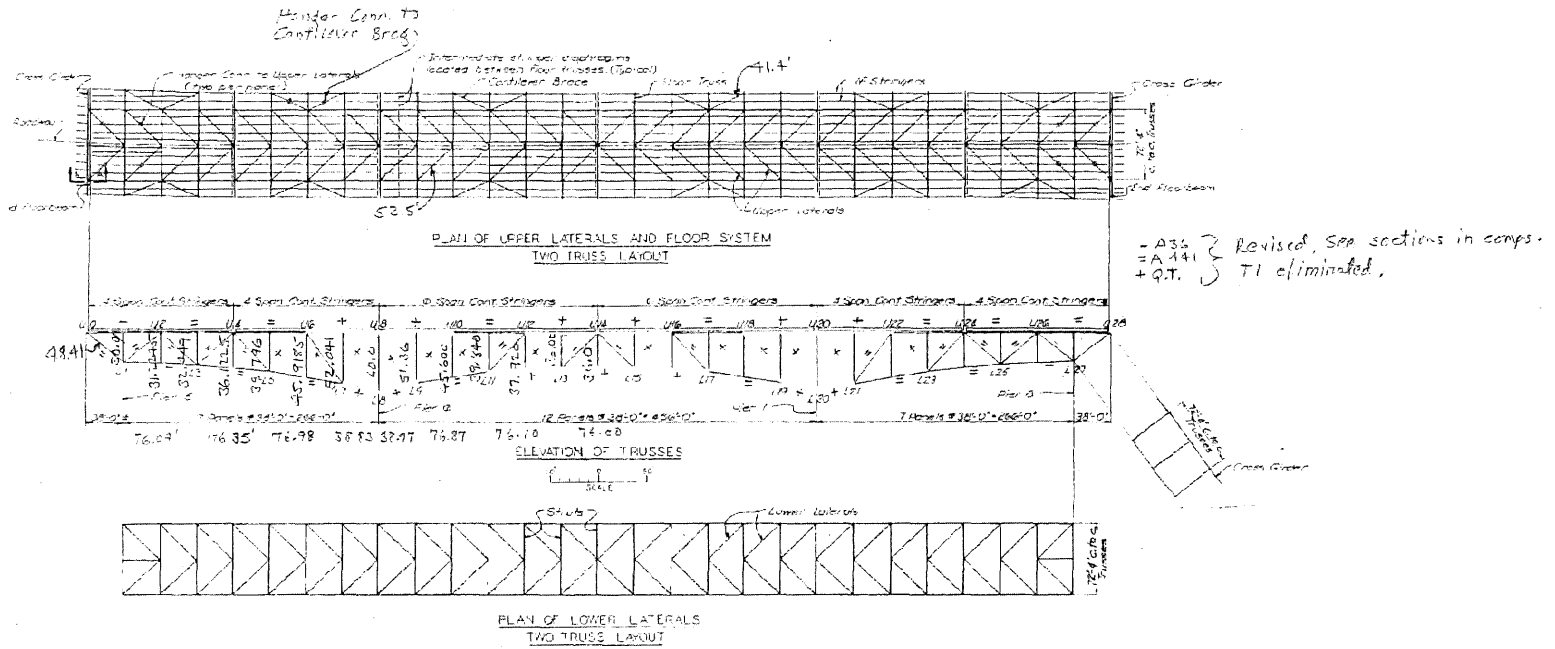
Proposed steel grades for truss members from 1963, later modified in 1964.
